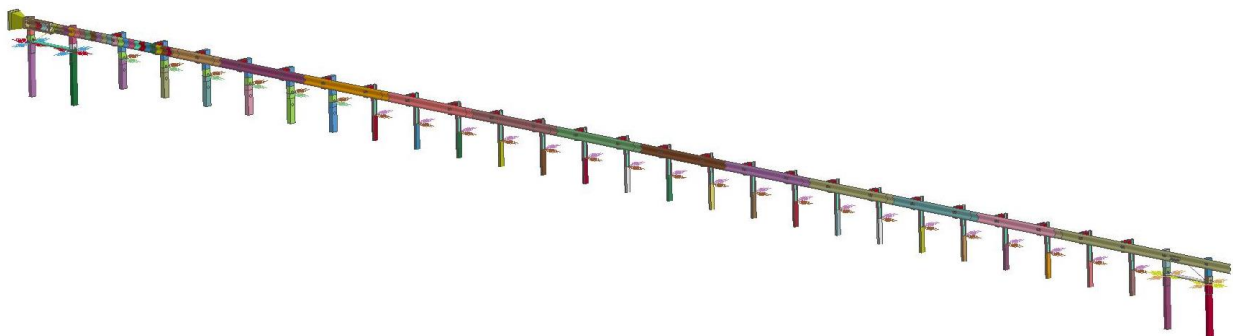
175-ft (53.3-m) Long Guardrail Model
